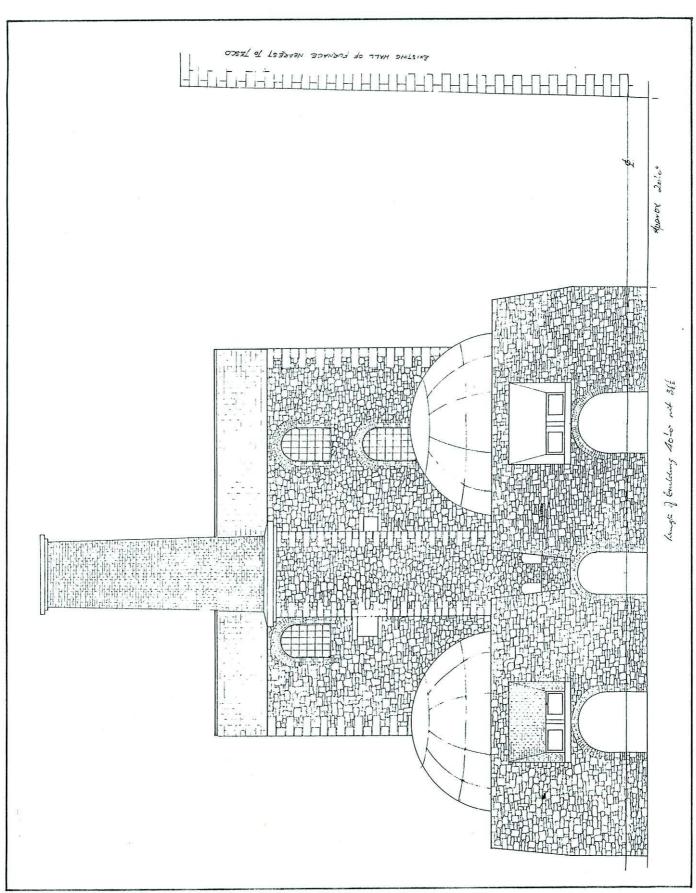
Reconstructed S.W. elevation of the 1827 Blowing Engine House (Courtesy Doug Williams, CVHS)
